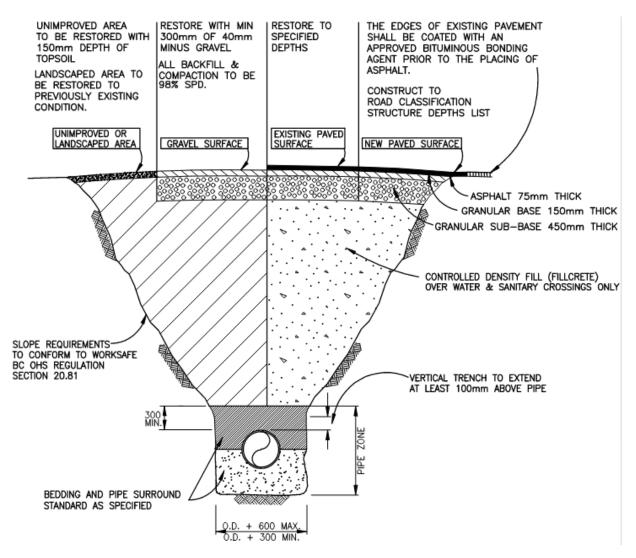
Typical Trench Detail for Harper Subdivision Sewer Installation
